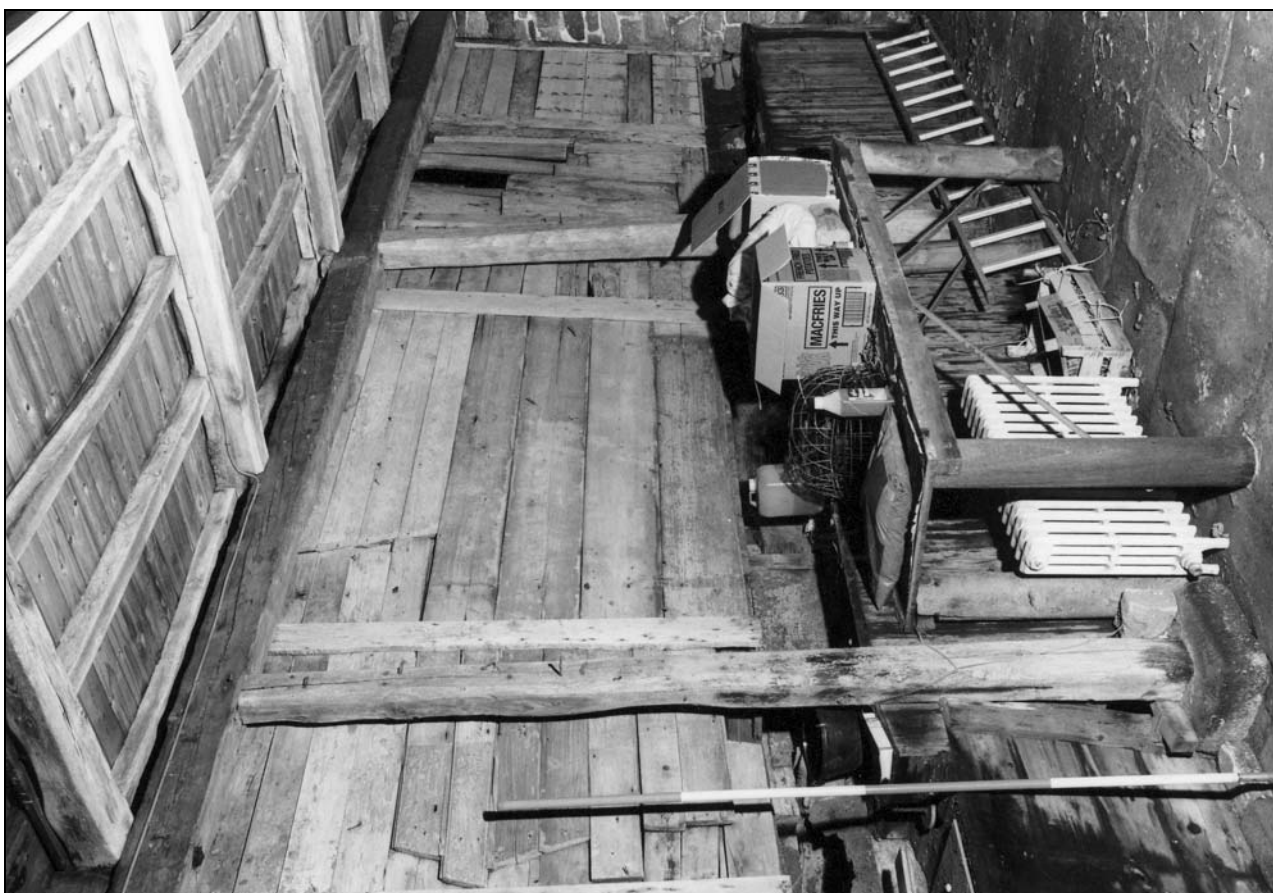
Secondary timber partition between central bay and stable/shippon, from the south-east (film 3, frame 6)
